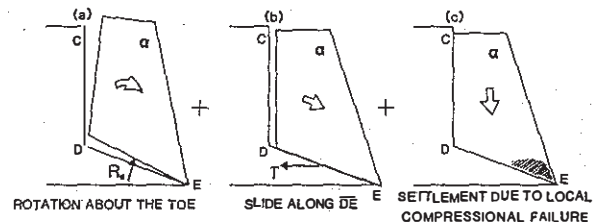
Three major failure modes of slope reinforced with a short reinforcement.
